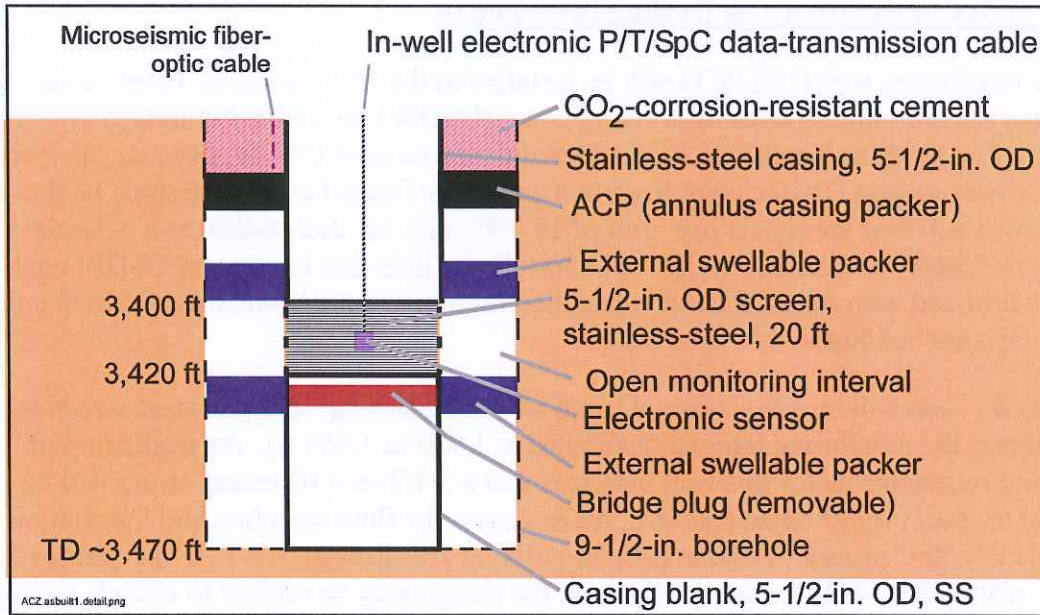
Construction Detail for ACZ Monitoring Wells.
